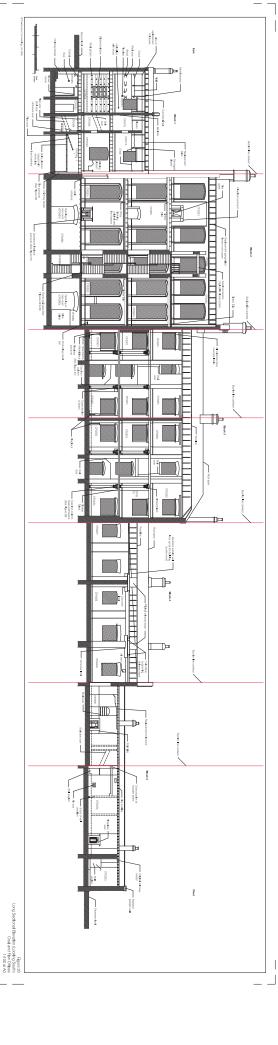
Second Floor Plan Coal and Fish Offices 1:100 at A2
